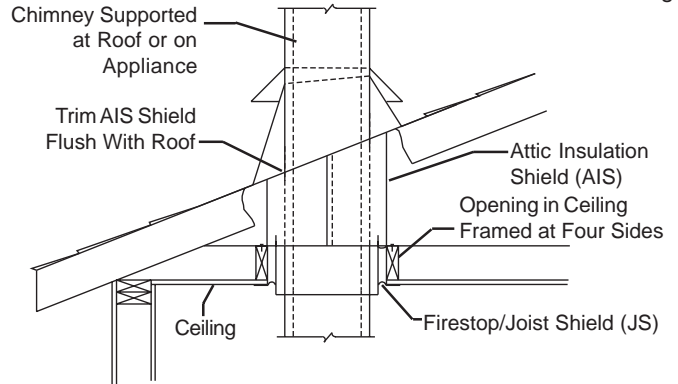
Intallation Of Attic Insulation Shield Near Eaves
